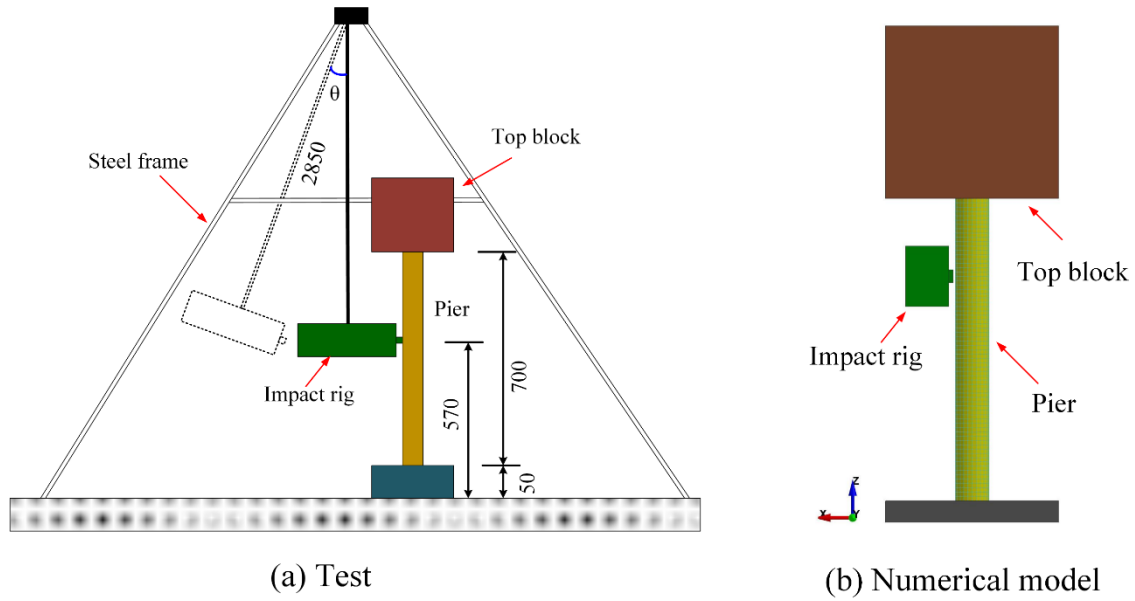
Pendulum impact test setup and numerical model (mm) [57]
